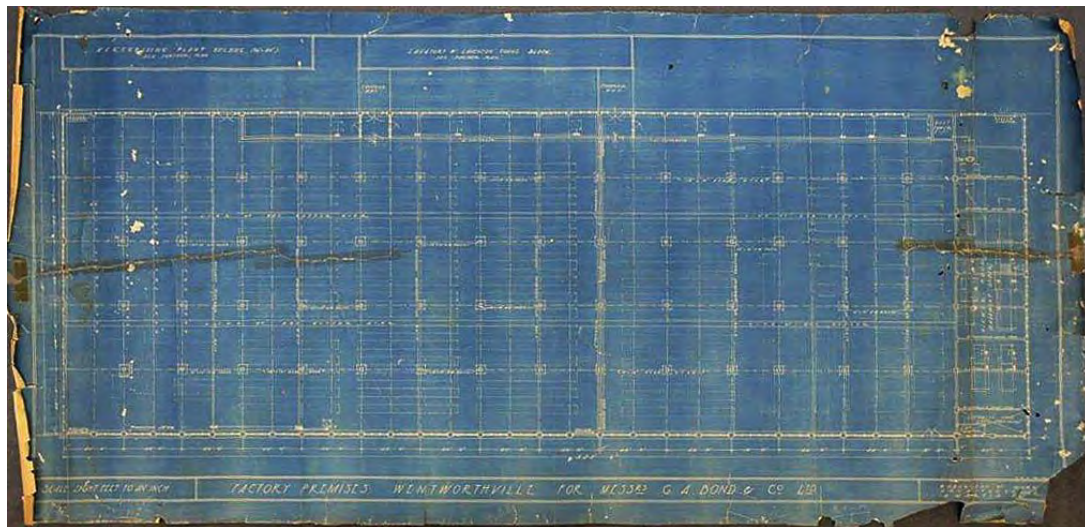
Plan of the Cutting Room by Robertson and Marks, Architects. (Source: Pacific Brands plan room)
